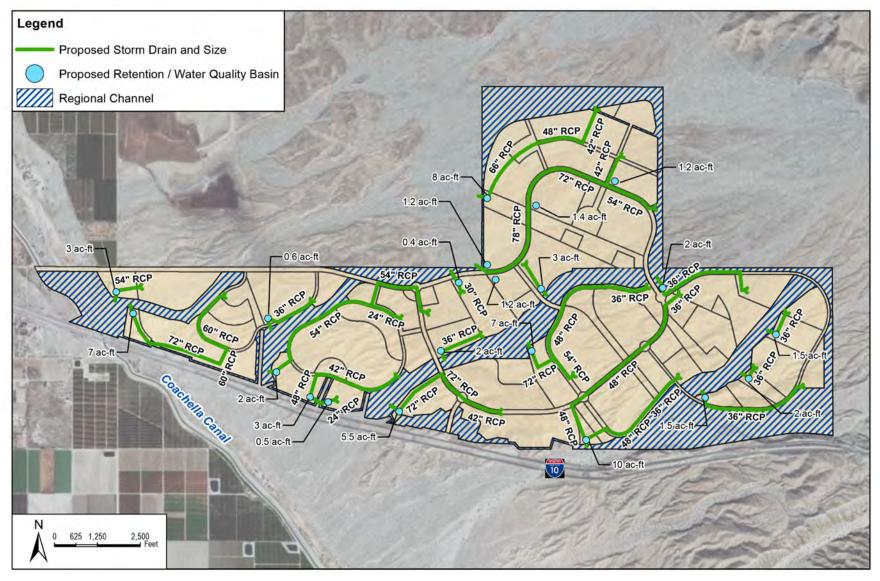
CONCEPTUAL DRAINAGE PLAN
